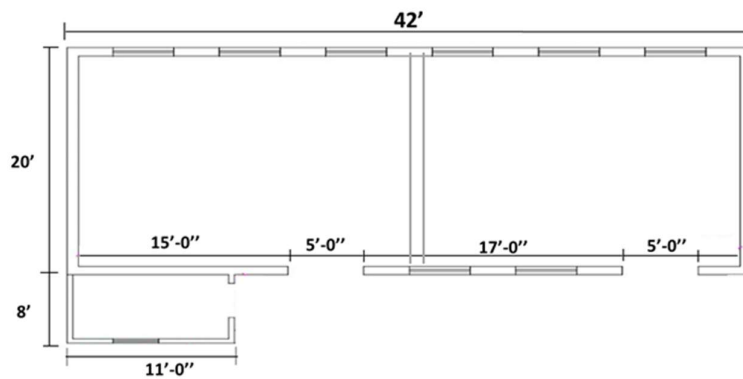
Plan view of a single unit of stone masonry schools, comprising two classrooms
